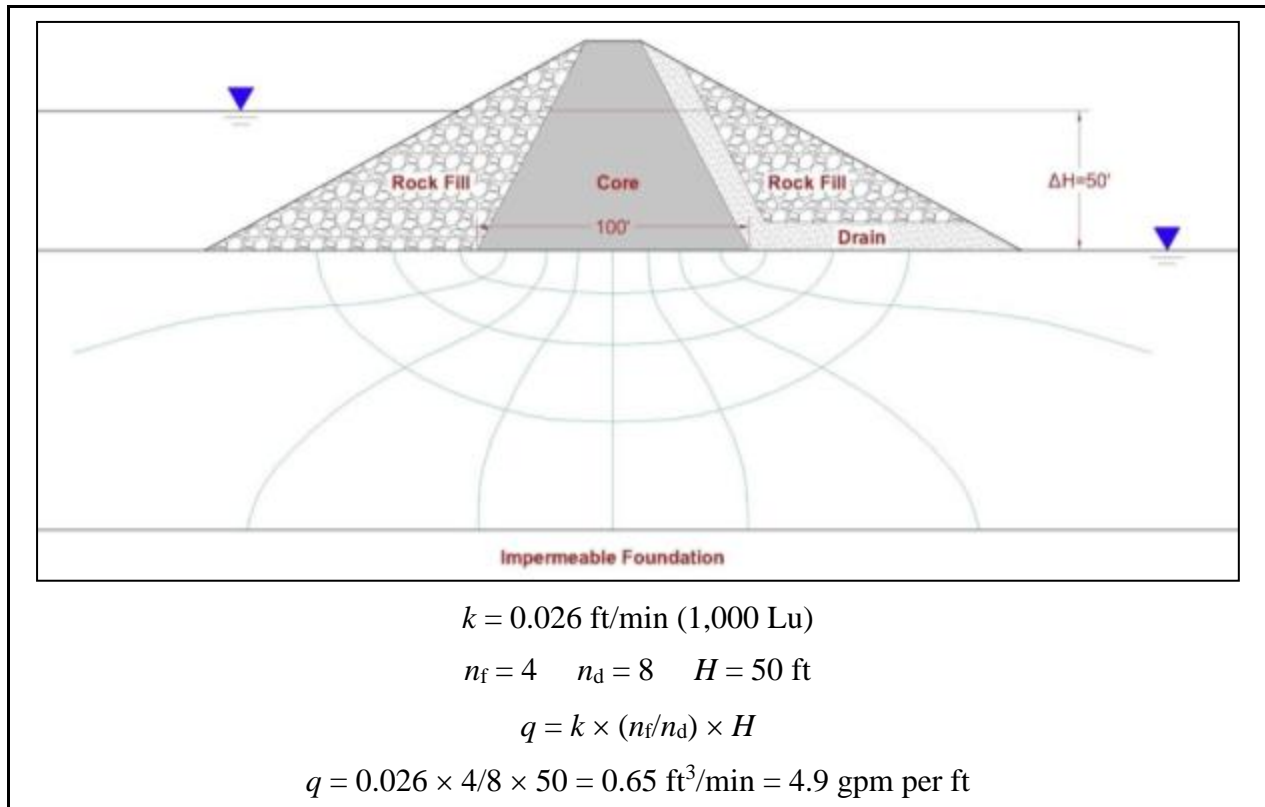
Example of flow net construction and calculations for a section with no treatment of the foundation.
